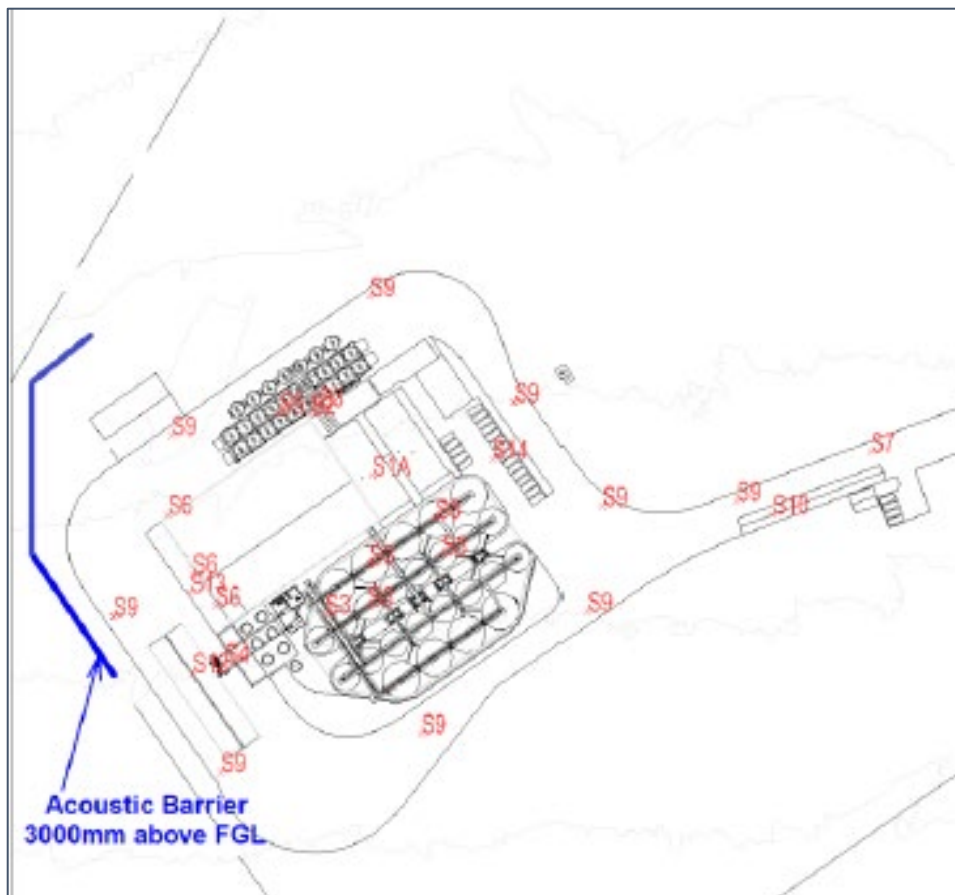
Noise Barrier Location (reverb Acoustics, 2024)
